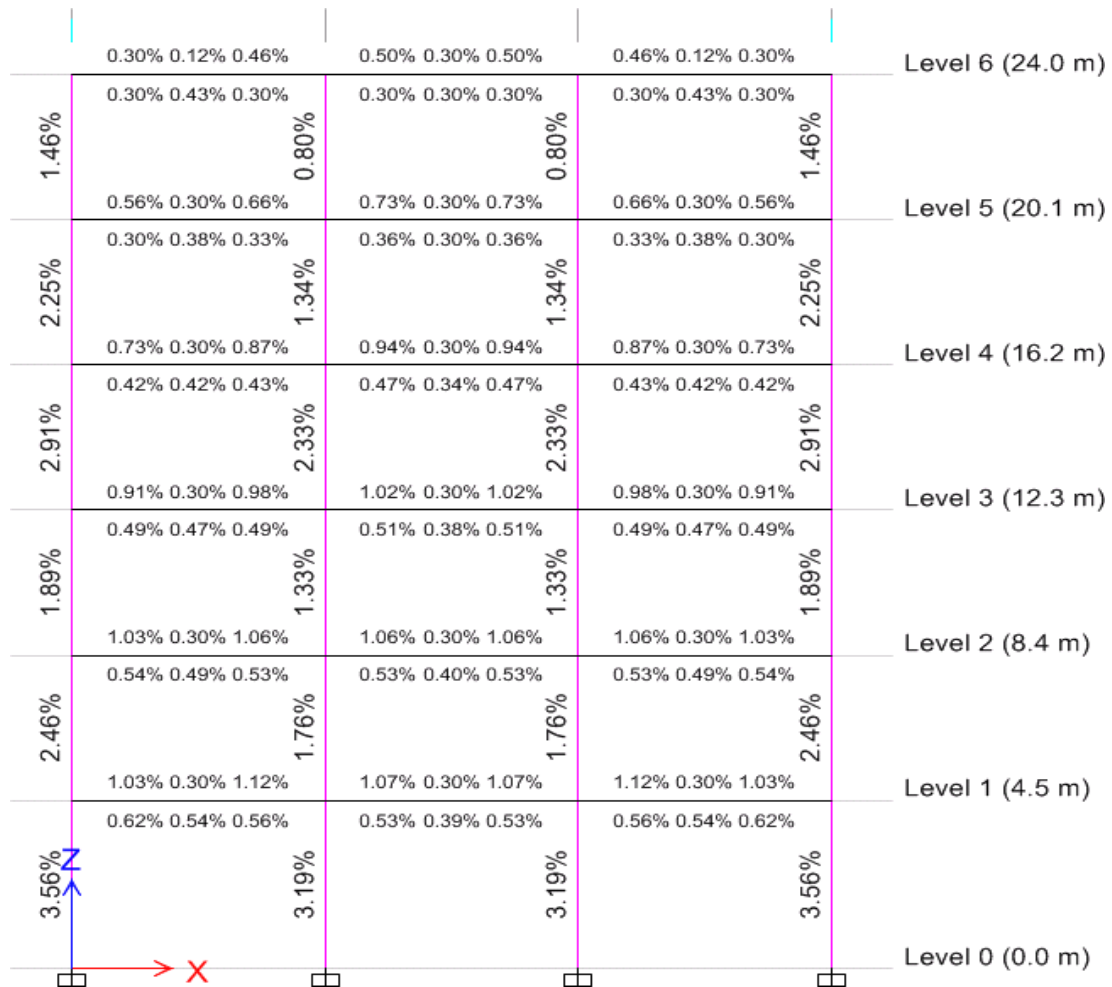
Required longitudinal reinforcement for building ID 2443
